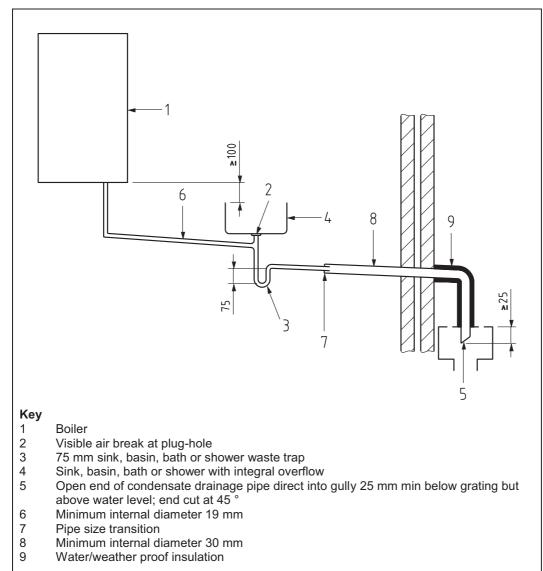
(b) – Connection of a condensate drainage pipe upstream of a sink, basin, bath or shower waste trap
